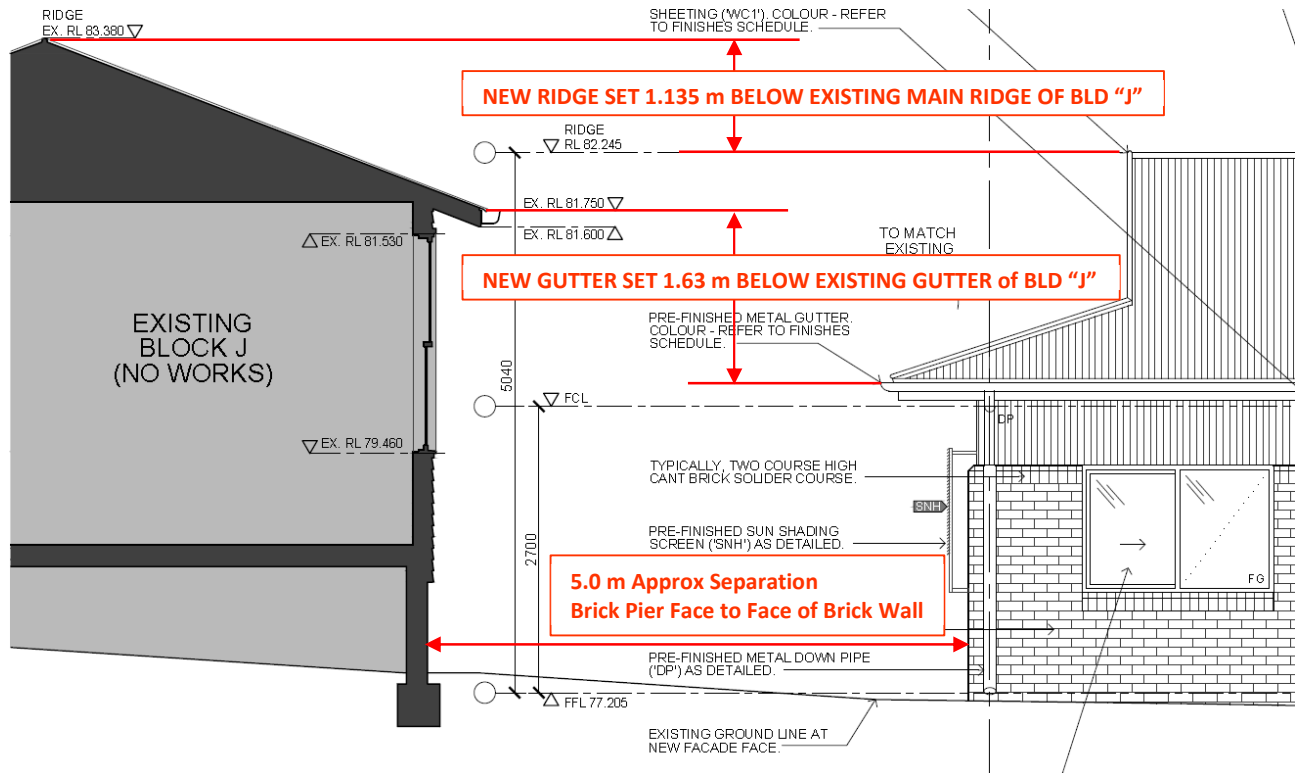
West Elevation & Detail Section through Building "J" Showing relative scale of proposed Additions. Refer Text for Notes:
